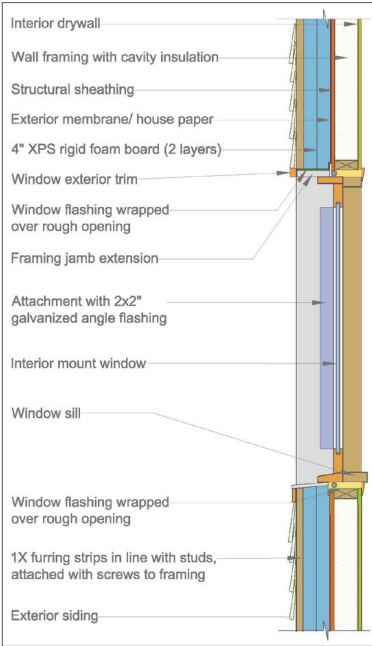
Interior Mount window: Installed at the plane of exterior structural sheathing. Requires extension jambos to the exterior which are attached to the house using angle flashing
